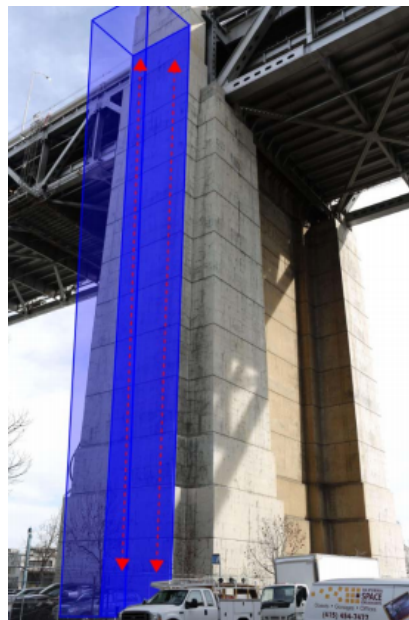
Example of a Bike Elevator for Lift up to Bridge Deck
